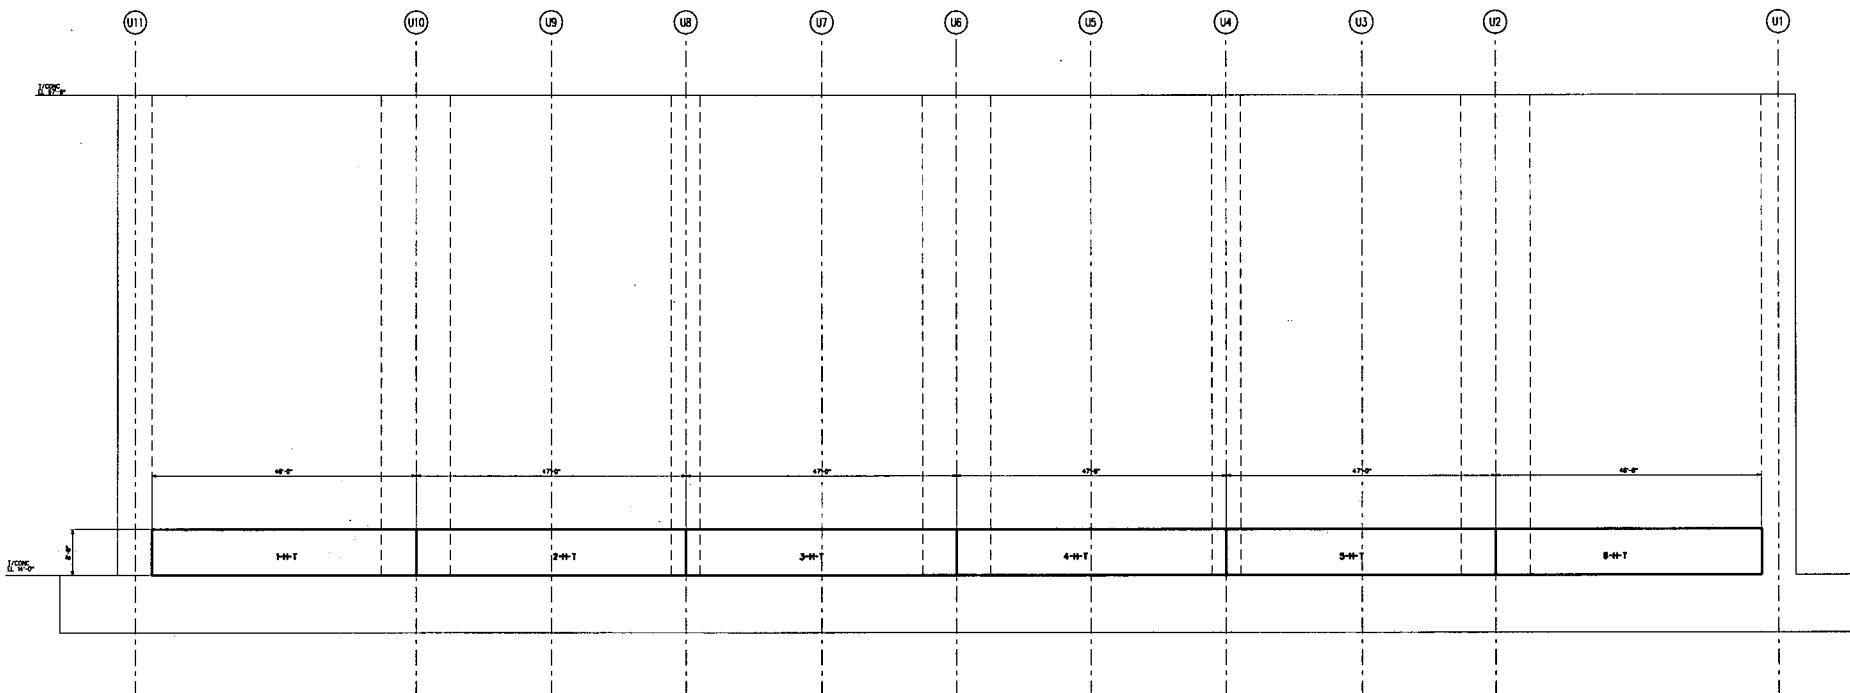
H.6-91: BASIN SOUTH WALL LOOKING NORTH
